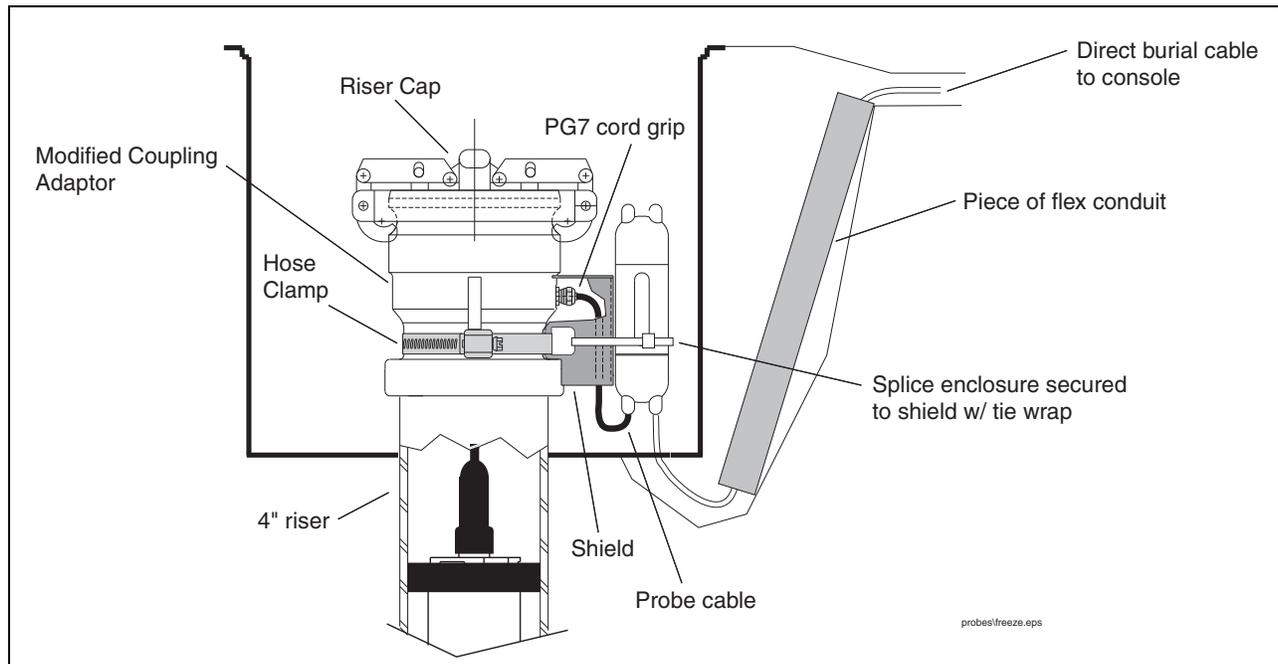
Mag probe vapor extractor riser installation - w/ coupling adaptor
